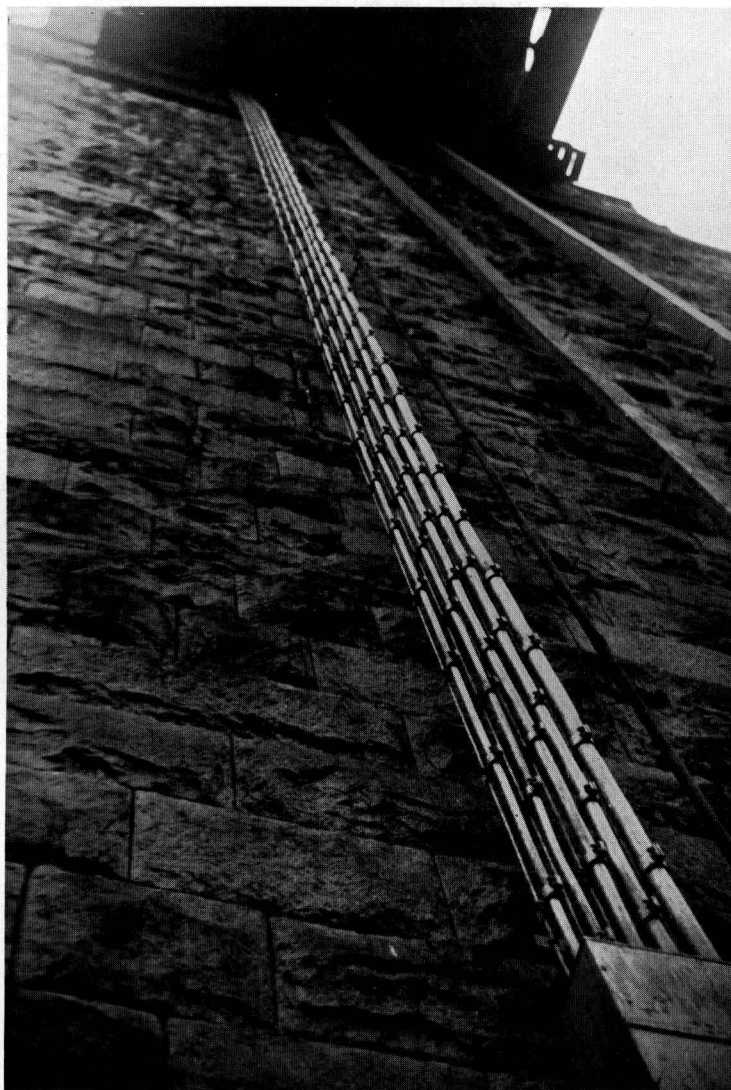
Forth Bridge—Vertical Suspension on North Pier.
